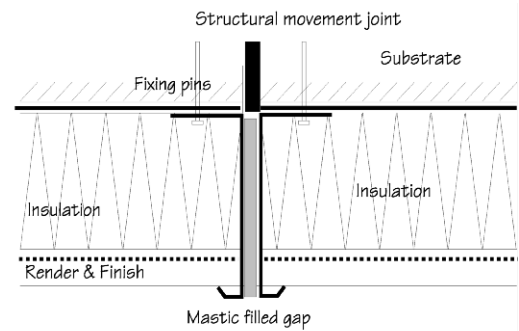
Detail of structural movement joint, showing two insulation panels meeting at the joint. Metal end-pieces are attached to the substrate to allow the building and insulation to shift together on either side of the joint. The exterior joint is caulked to prevent water entry. The method is designed to allow shifting from structural and thermal stress. From Pearson (2006).
